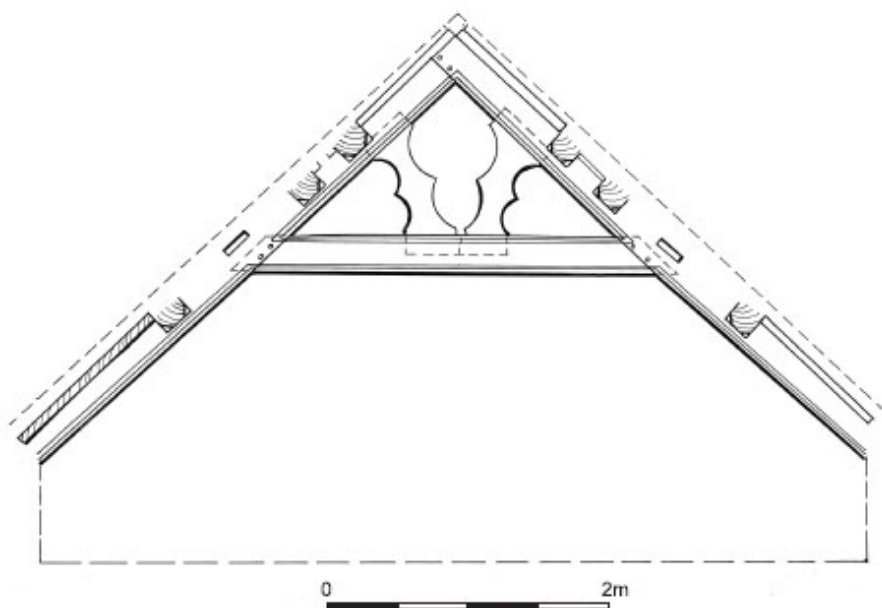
One of the roof trusses of 29 Castle Street in its present position above an inserted floor (dashed line); the peg holes and mortices for the missing arch-braces beneath the collar are hidden by added slips of timber
